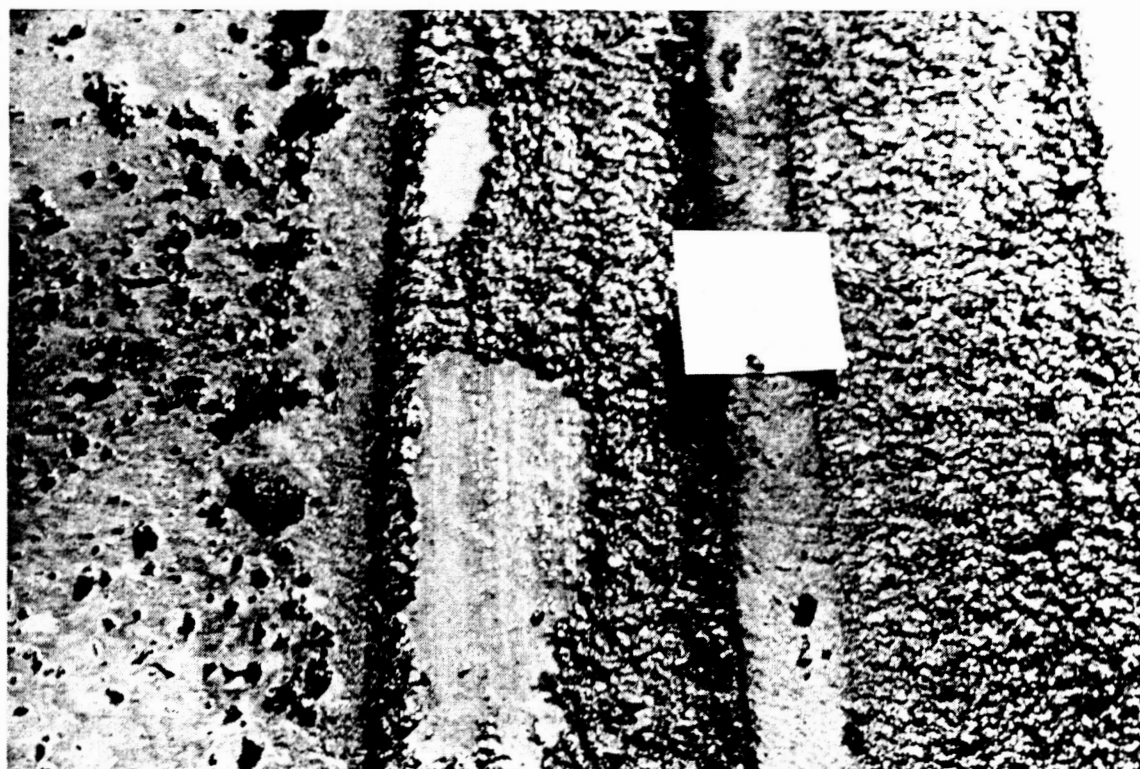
Rubberized section R1.5 @ 20,864 reps
